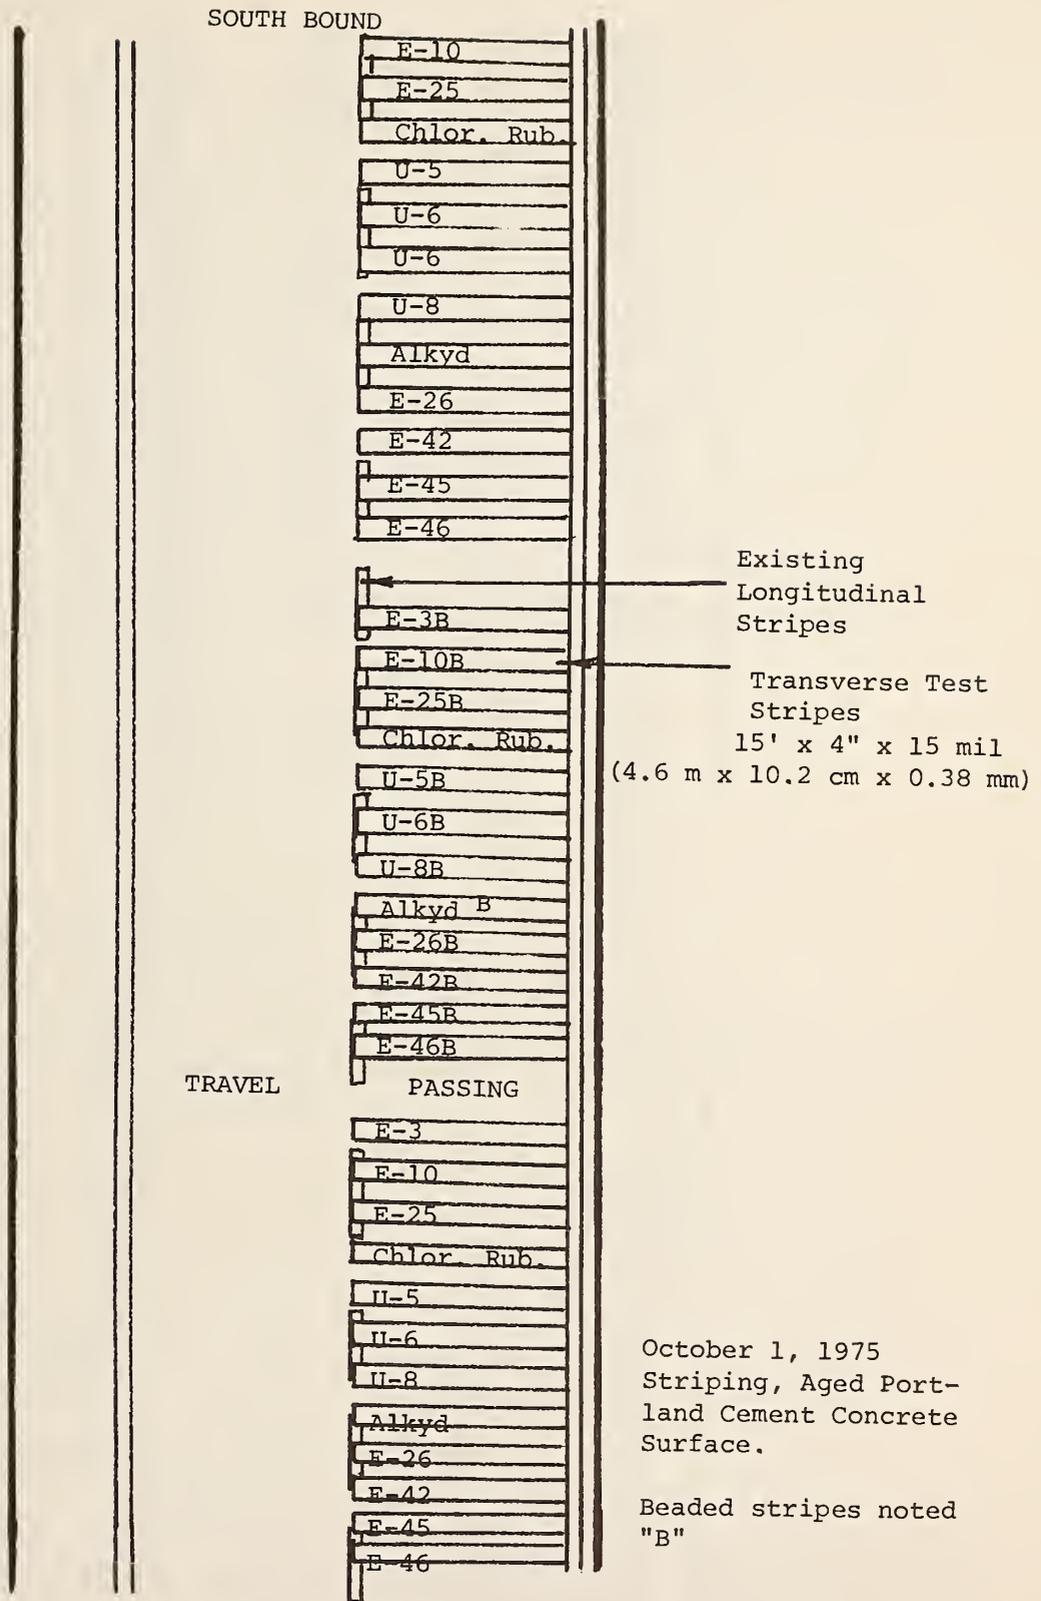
ROUTE 1 DANVERS, MASSACHUSETTS, STRIPING LAYOUT
